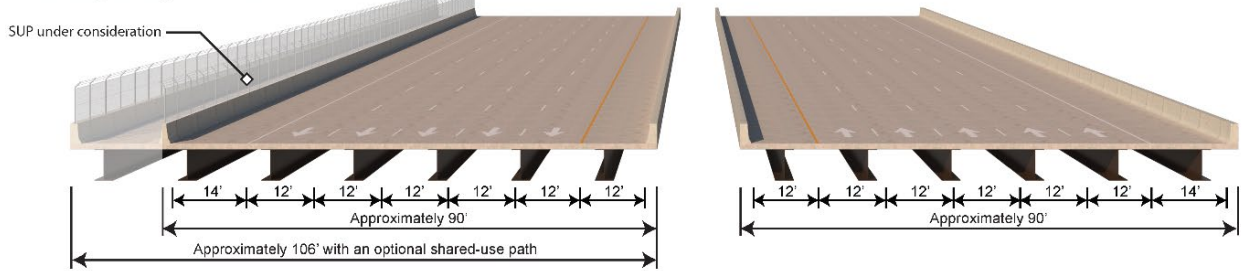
Alternatives F and G (8-10-8) Typical Sections for U.S. 50/301
